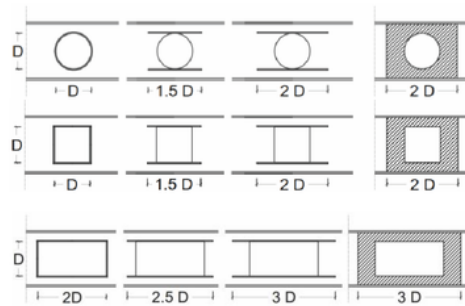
Detail of stiffener (all around, AA; short horizontal, SH; long horizontal, LH; doubler plate, DP)
